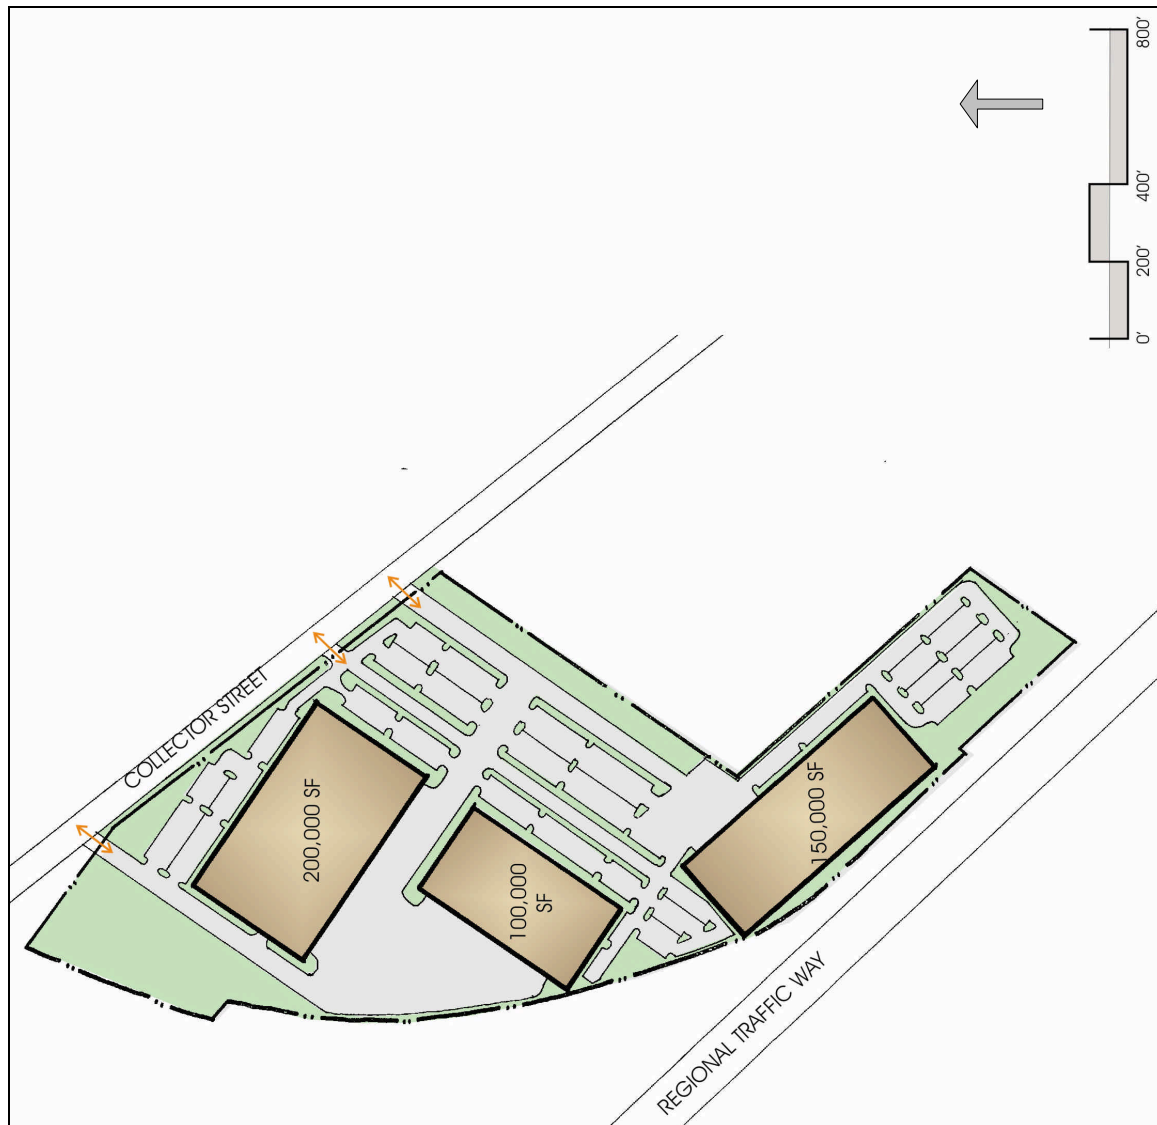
General Manufacturing Brownfield Conceptual Site Plan
